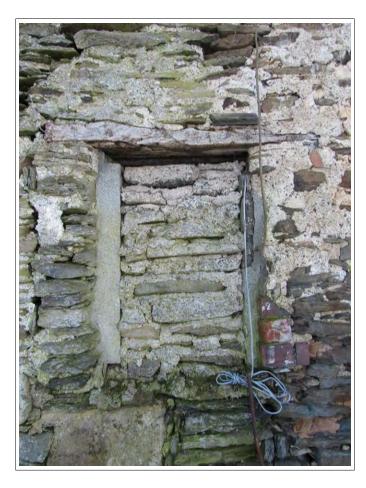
The barn north-west elevation blocked window, view south-east. 1m scale
